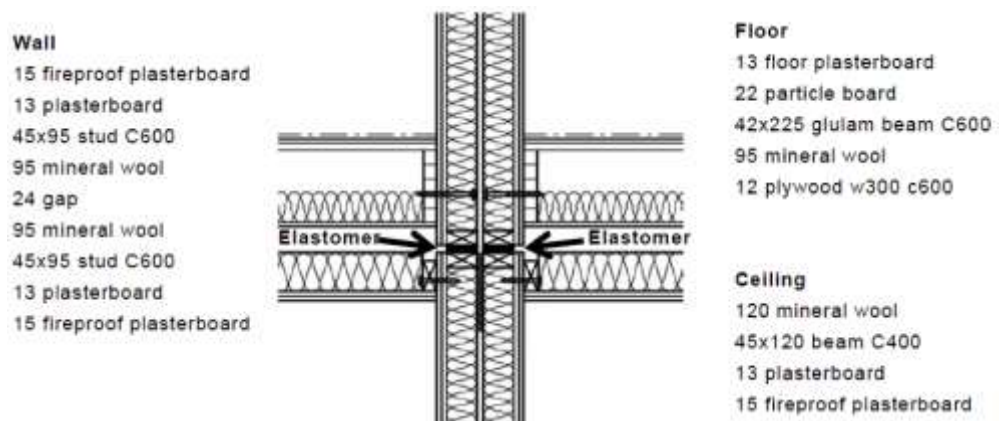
Drawings of a TVE-based building - Apartment separating walls.
